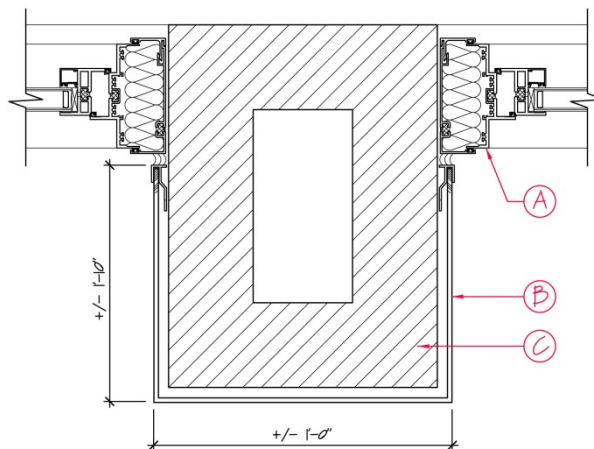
Cladding / encapsulation at typical Type 'B' windows. A = new aluminum window; B = new metal composite material cladding; C = existing brick veneer pier.
